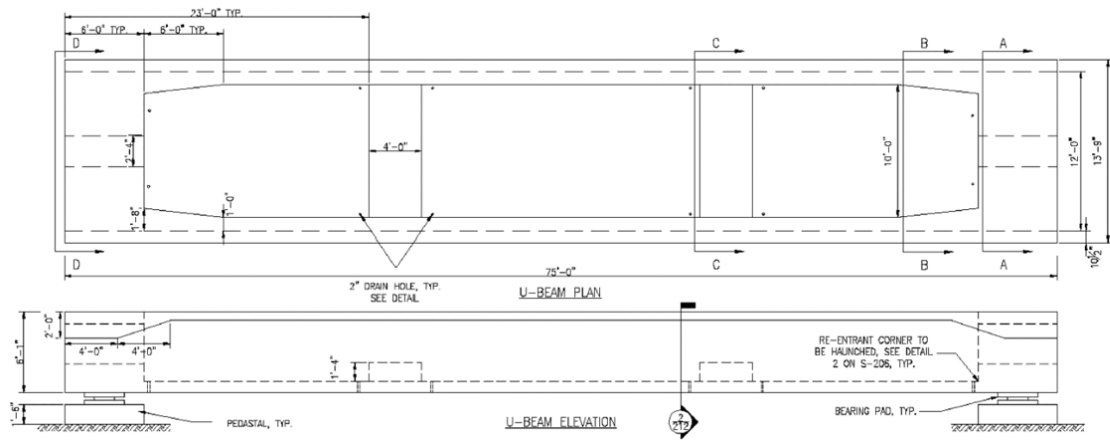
Plan and elevation of mock-up bridge girder for NCHRP study by Hurlebaus et al. <sup>15</sup>
